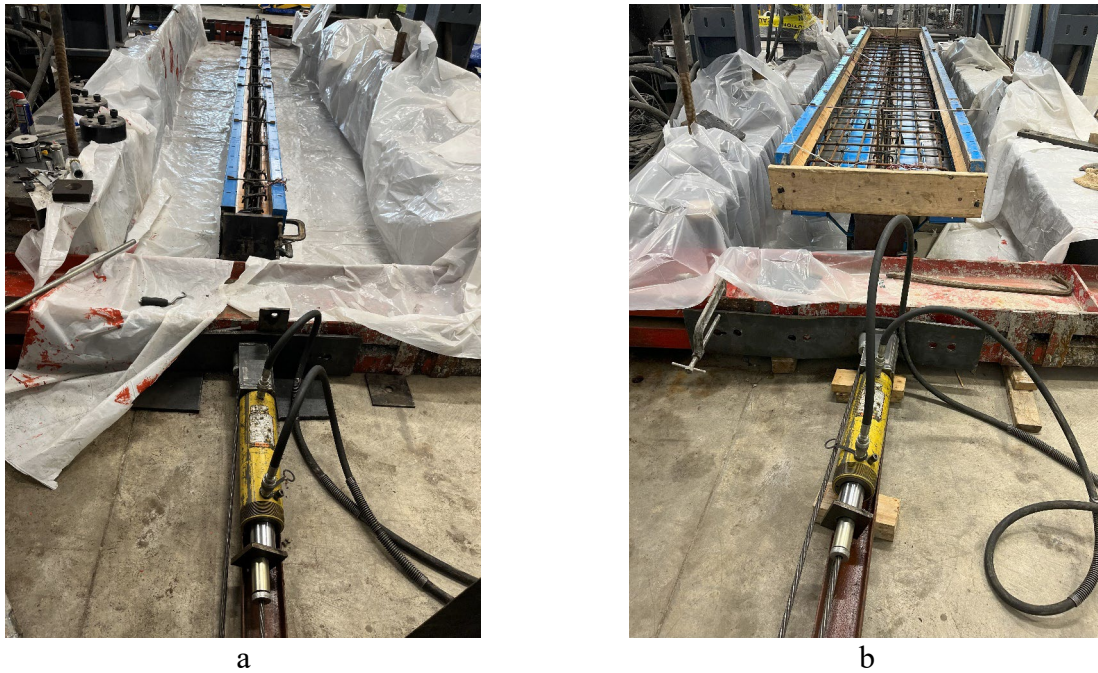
Strands Prestressing of test specimens (a) Isolated beam, (b) T-Beam
